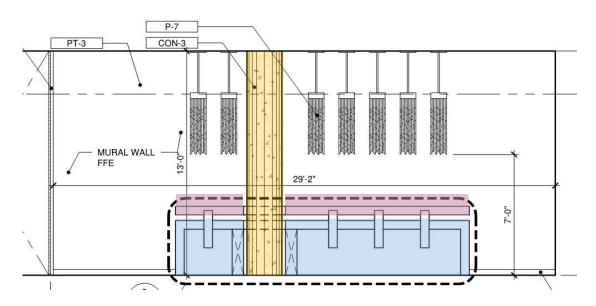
| Level 1 Interior Elevation - Concierge Desk
